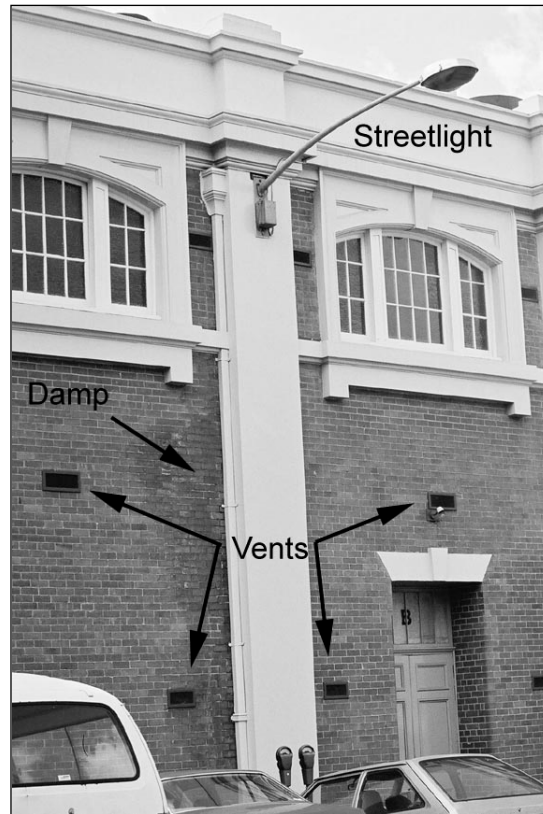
Vents, street lights and evidence of damp near exit 'B' on the Market Place façade.
